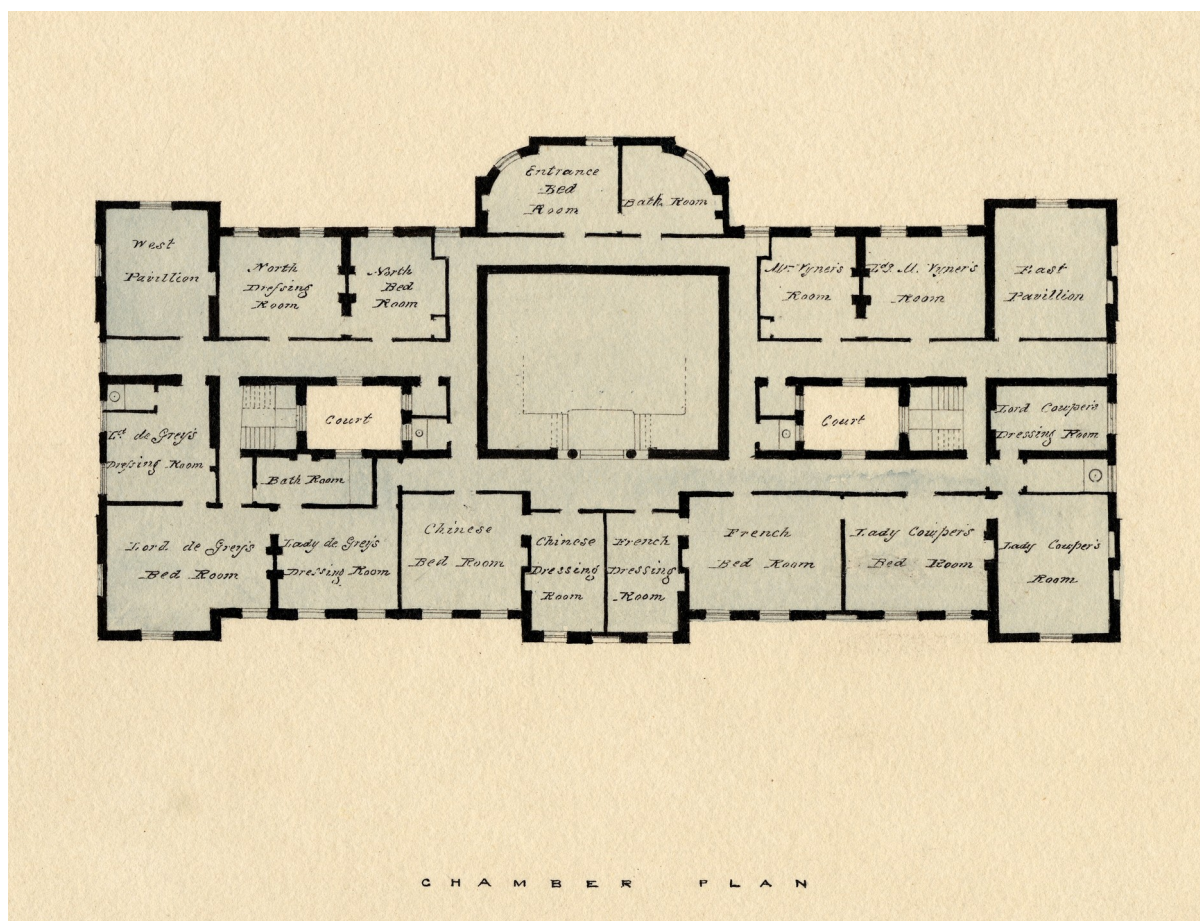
Undated plan of first floor, by Earl de Grey © RIBA.
